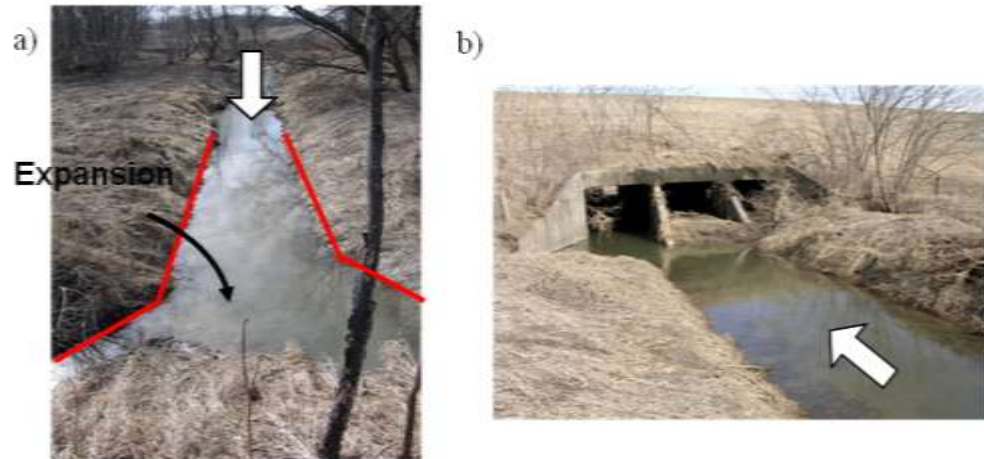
Silted culvert: a) view upstream from the culvert, and b) view of the culvert entrance
